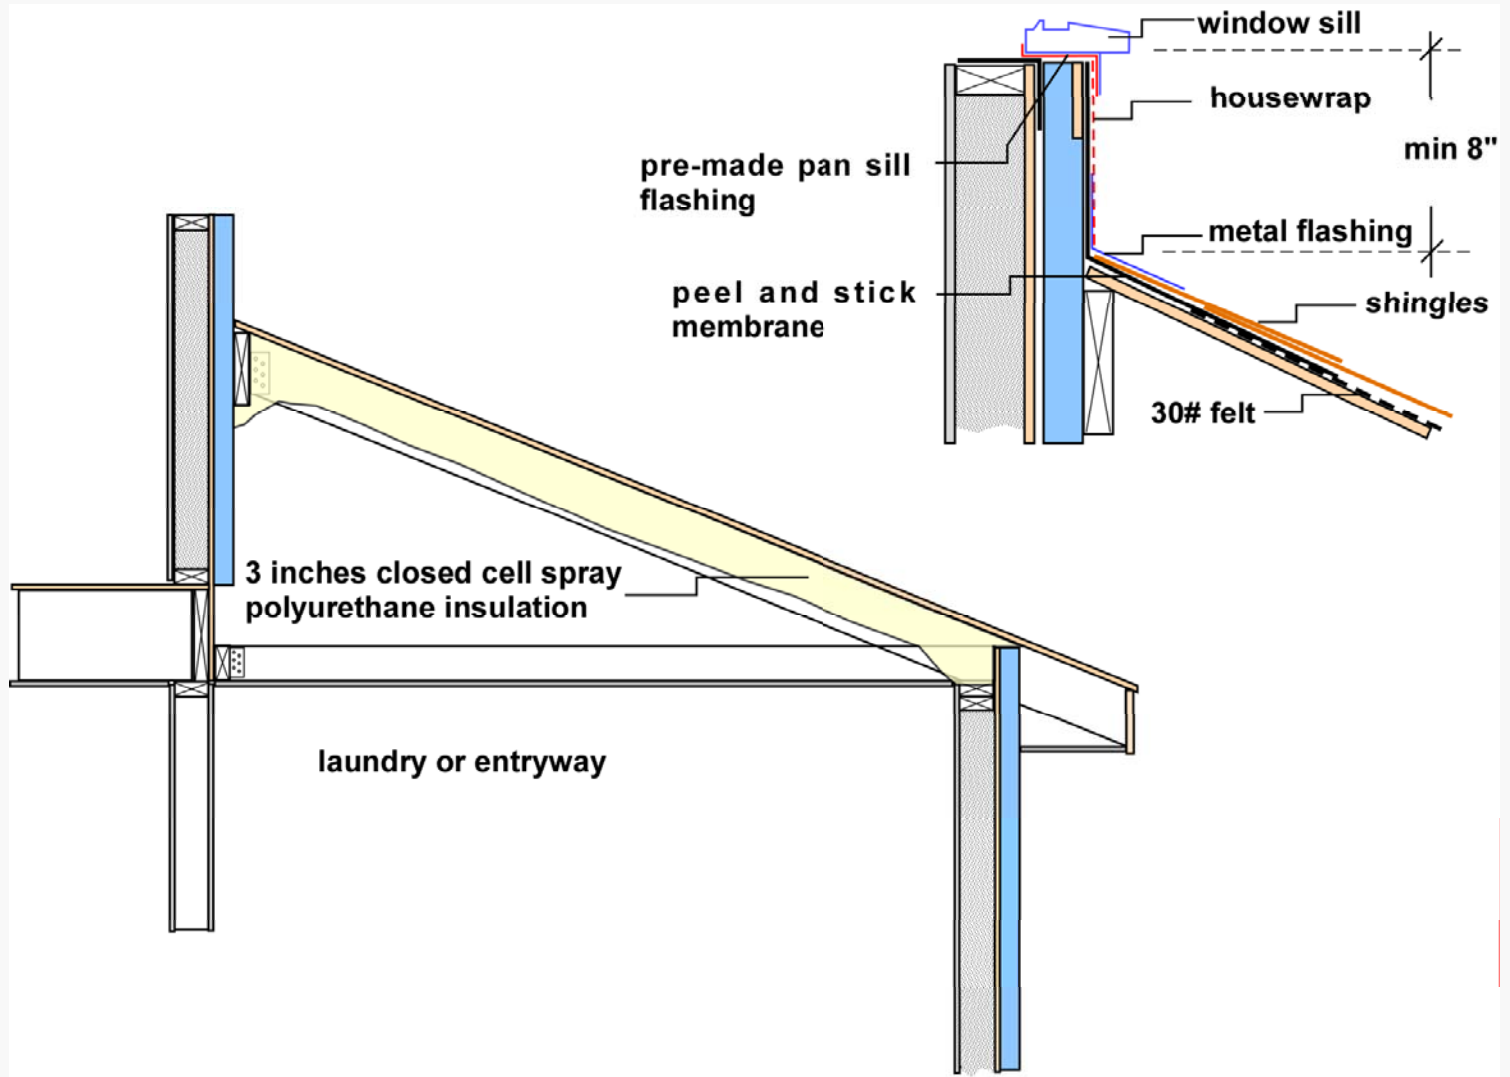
Insulated roof above laundry - powder room. Section through entry attic done same way.
